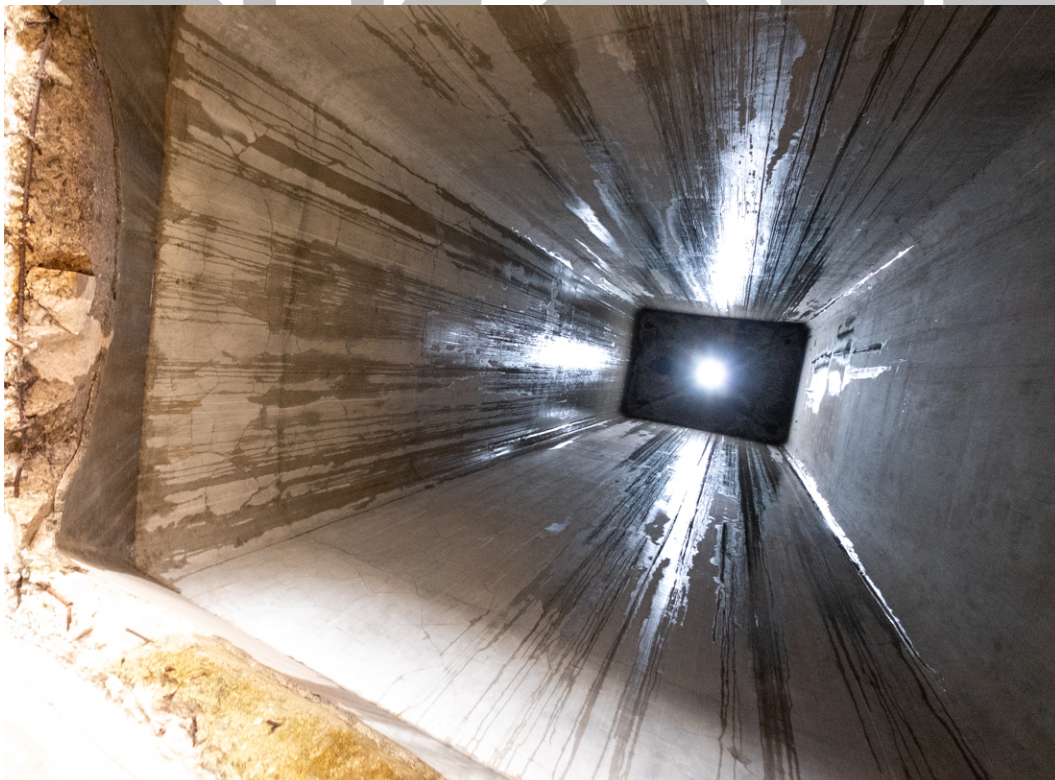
Interior view of concrete silo in Malthouse 3. This is part of a group of 8 silos that were added to the building after its first construction.. Paul Davies 2019.
